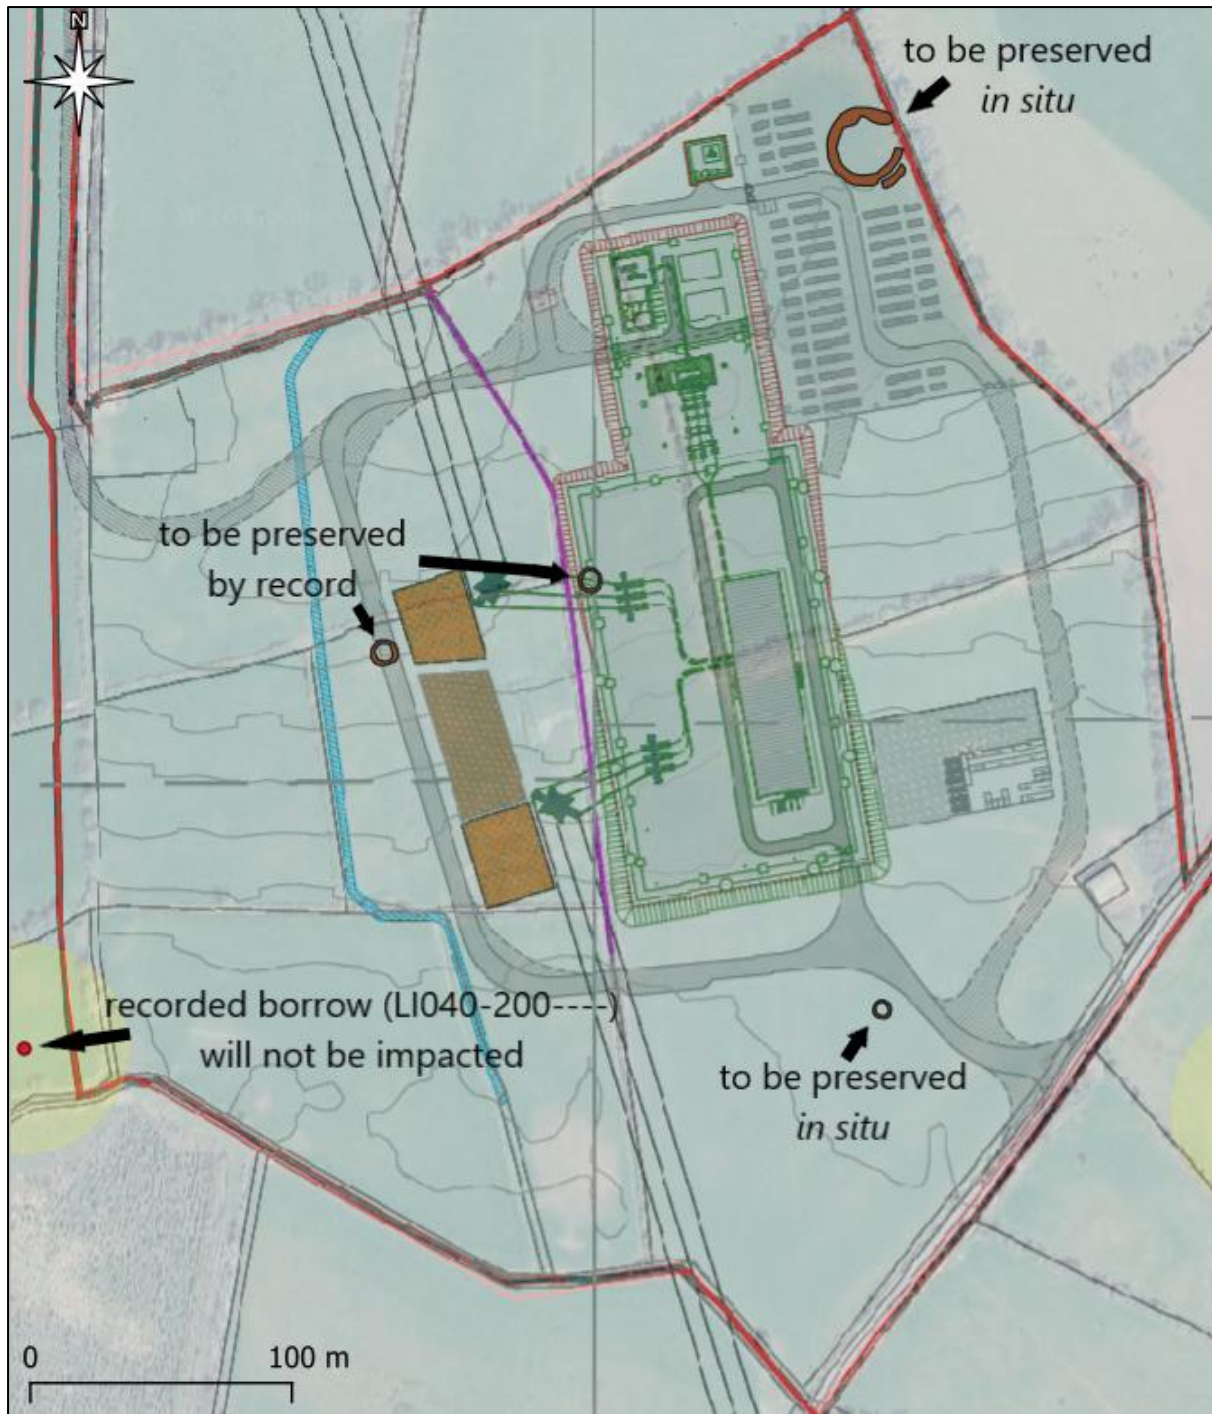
Site layout plan with imagery of identified archaeology, showing recommended mitigation
